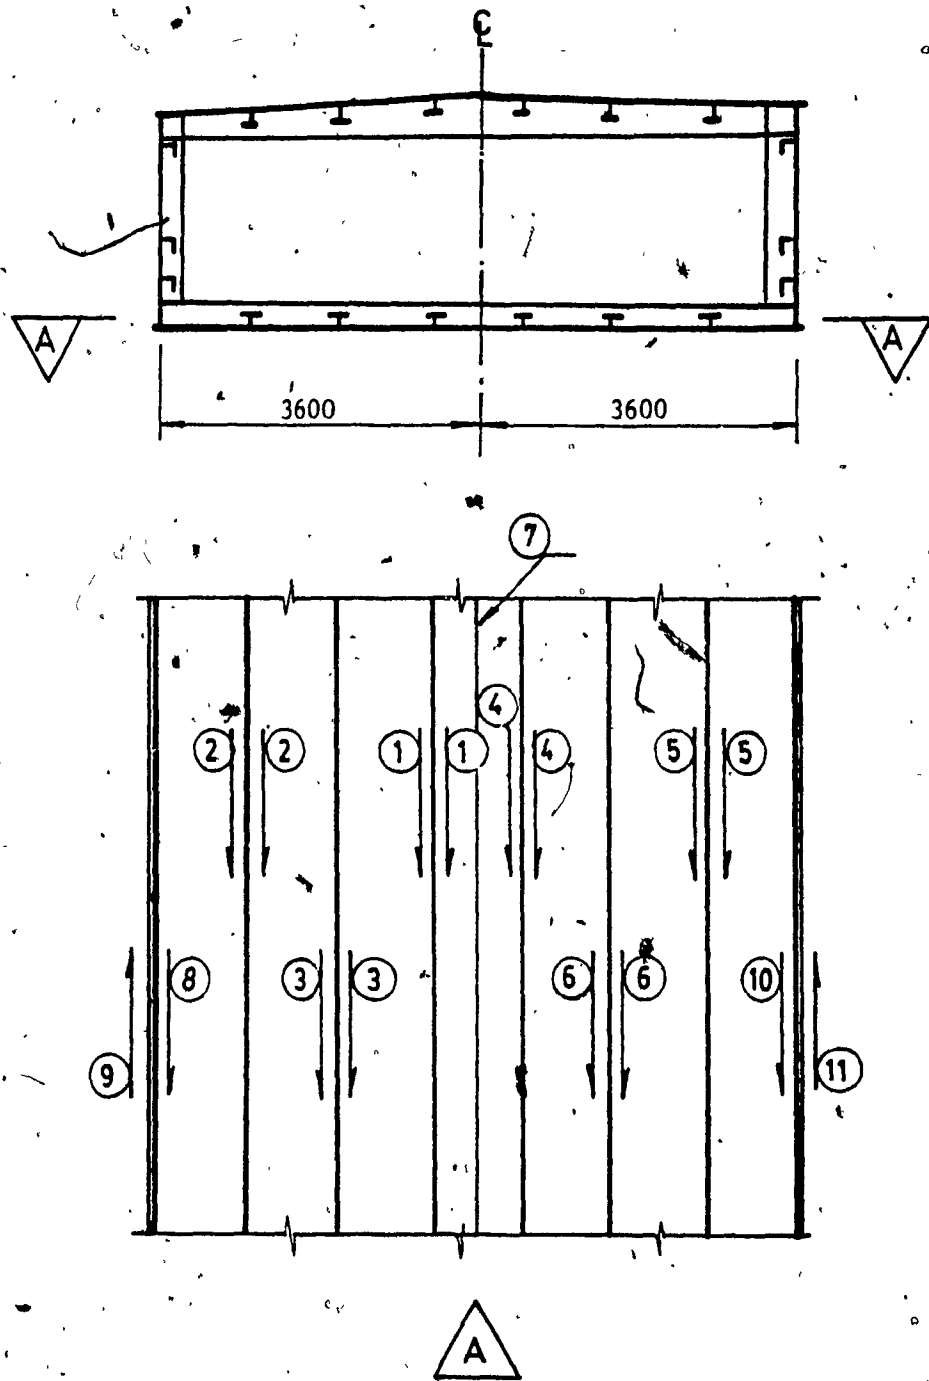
Hunt Club - Rideau Bridge. Welding Sequence of Bottom Flanges
